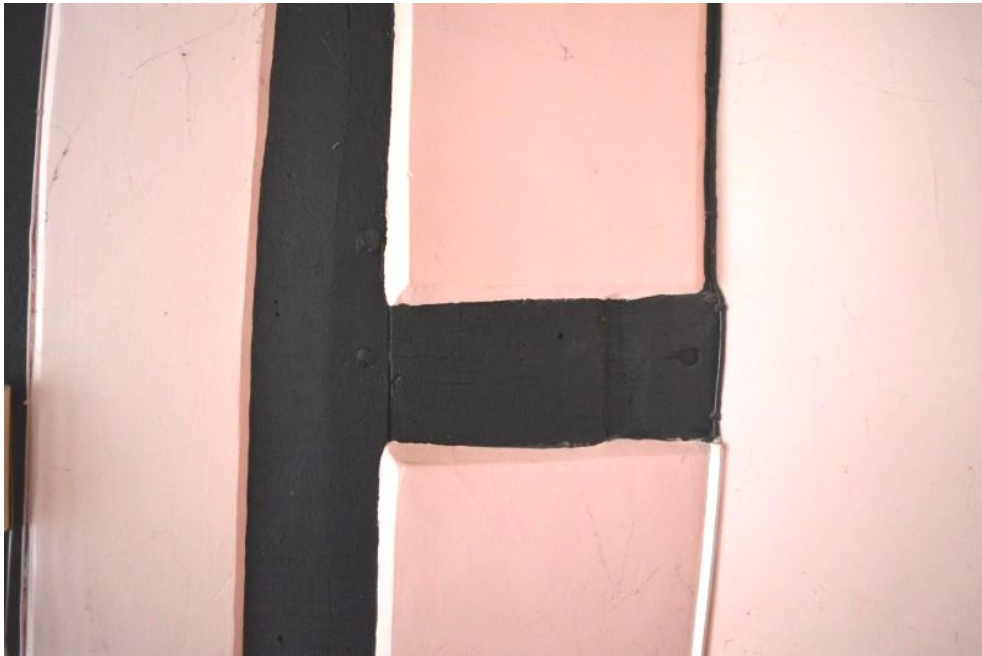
Scored carpenters' marks in north wall of kiosk, view north
